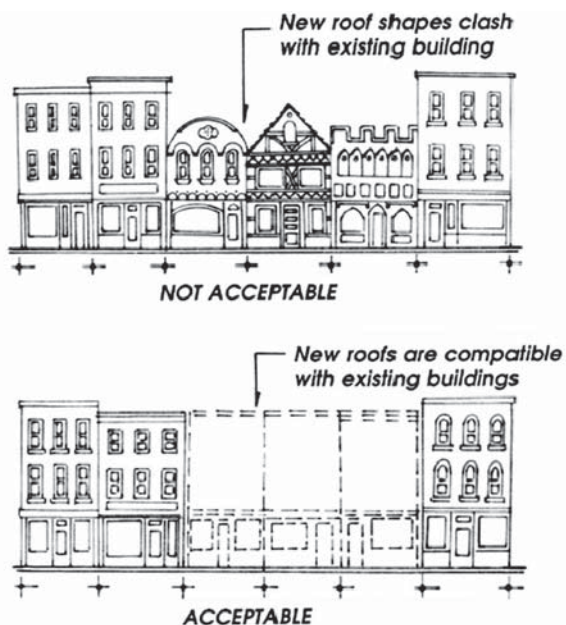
Roofs are an opportunity to incorporate architectural design elements. However, overall roof forms should be flat.
